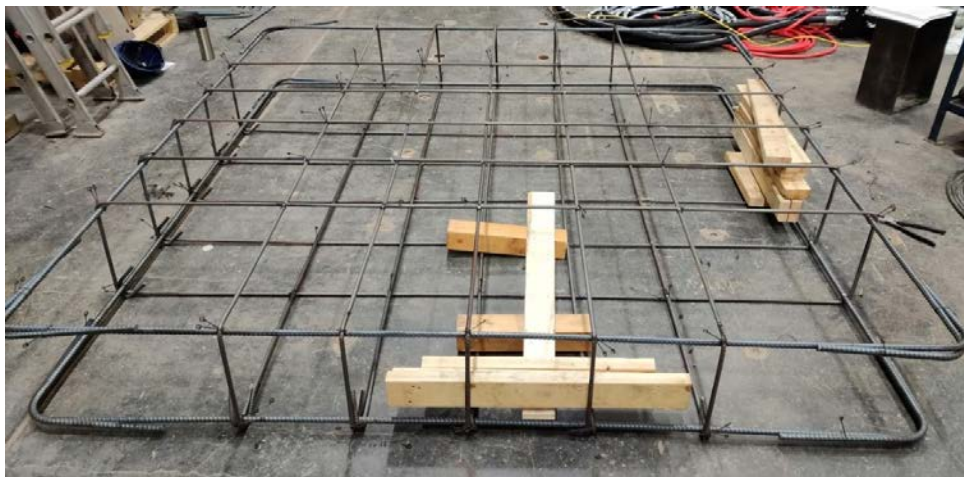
Reinforcement cage for SEP4 concrete specimen
